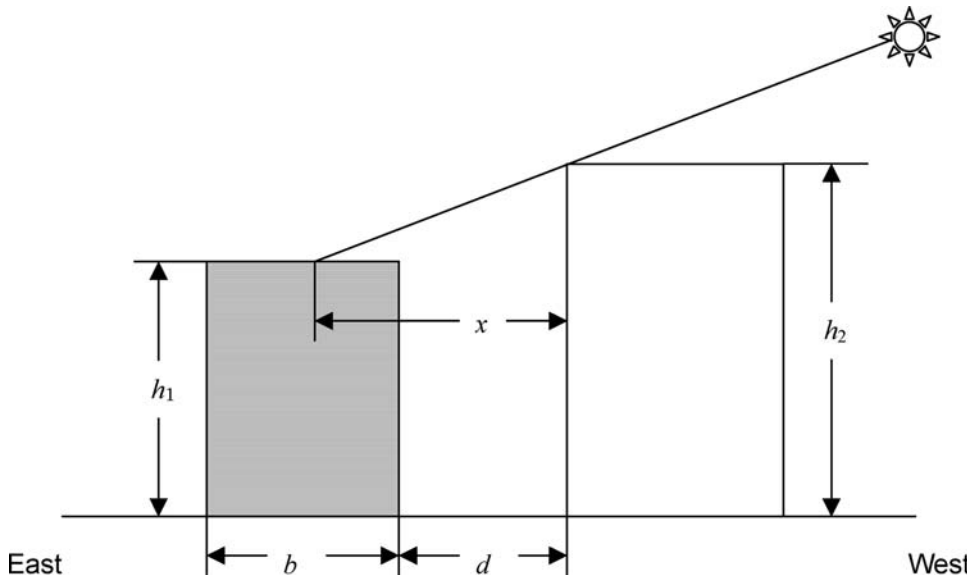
Path of the direct insolation to the roof of a building (east-west cross-section).
